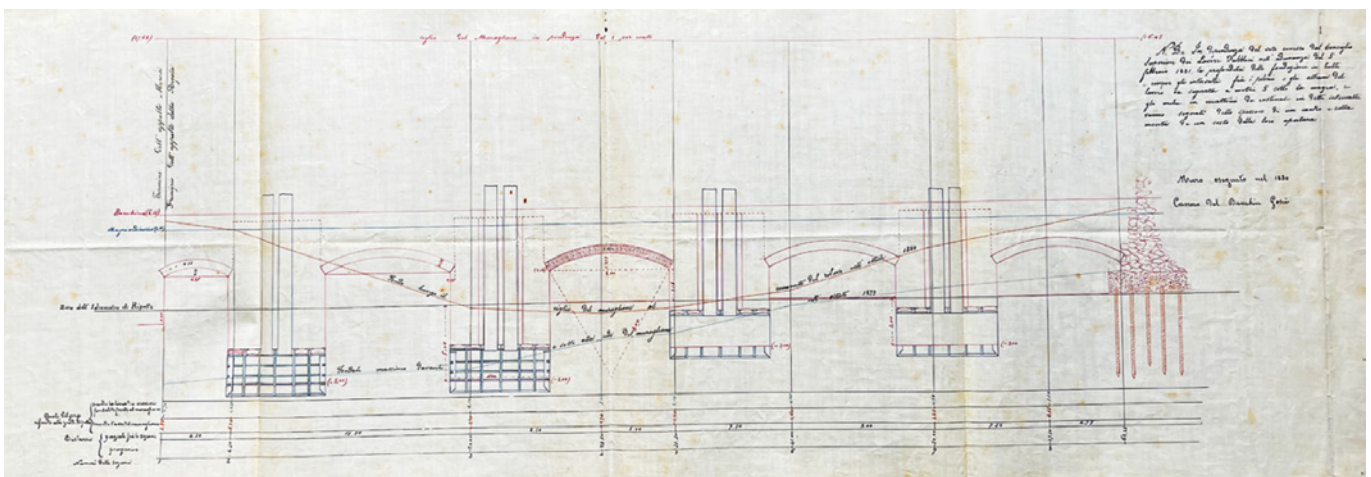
IICM, wrought-iron caissons for the retaining walls' foundations, 1882 (courtesy of Rome State Archive, USTRA collection).
